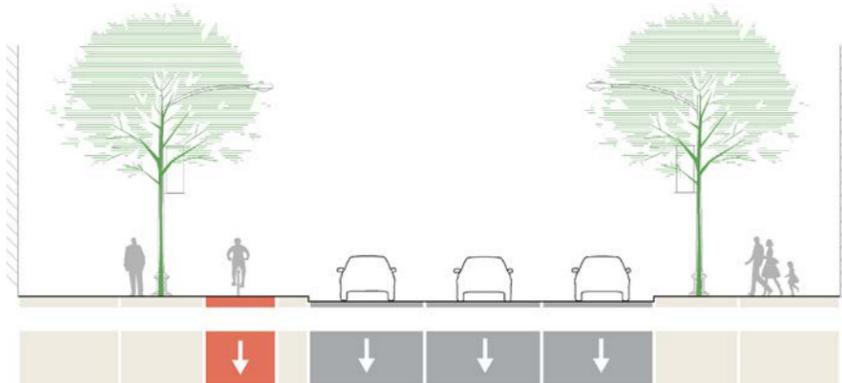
Eighth Street typical section Trinity Street to I-35
